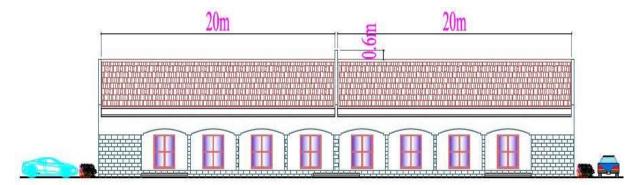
Proposed market shop building with 0.6 metre height of the wall barrier at the middle of its total horizontal length.
